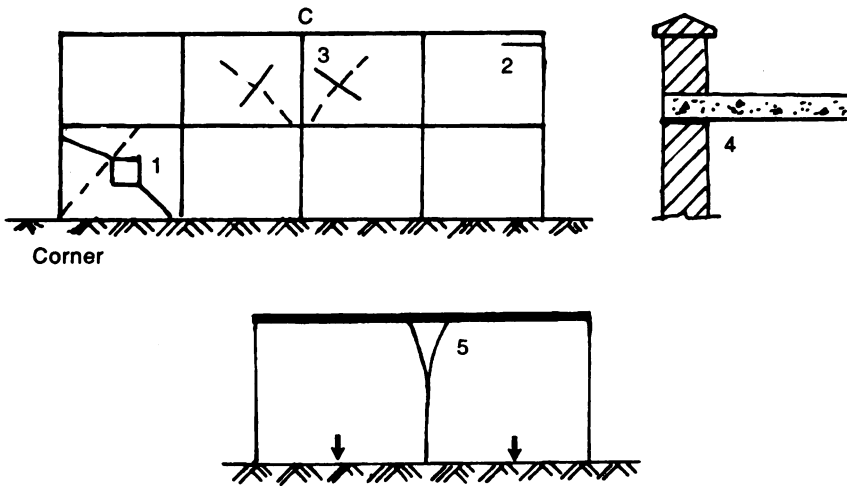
Cracks in masonry due to various causes: 1. Crack due to settlement of corner, 2. Crack under RC slab due to lifting up of corners in two way slabs, 3. Cracks due to settlement of column C, 4. Cracks below slab as a result of the movement due to temperature effects, 5. Crack with larger width at top due to heaving of centre as occurs in black cotton soils.
